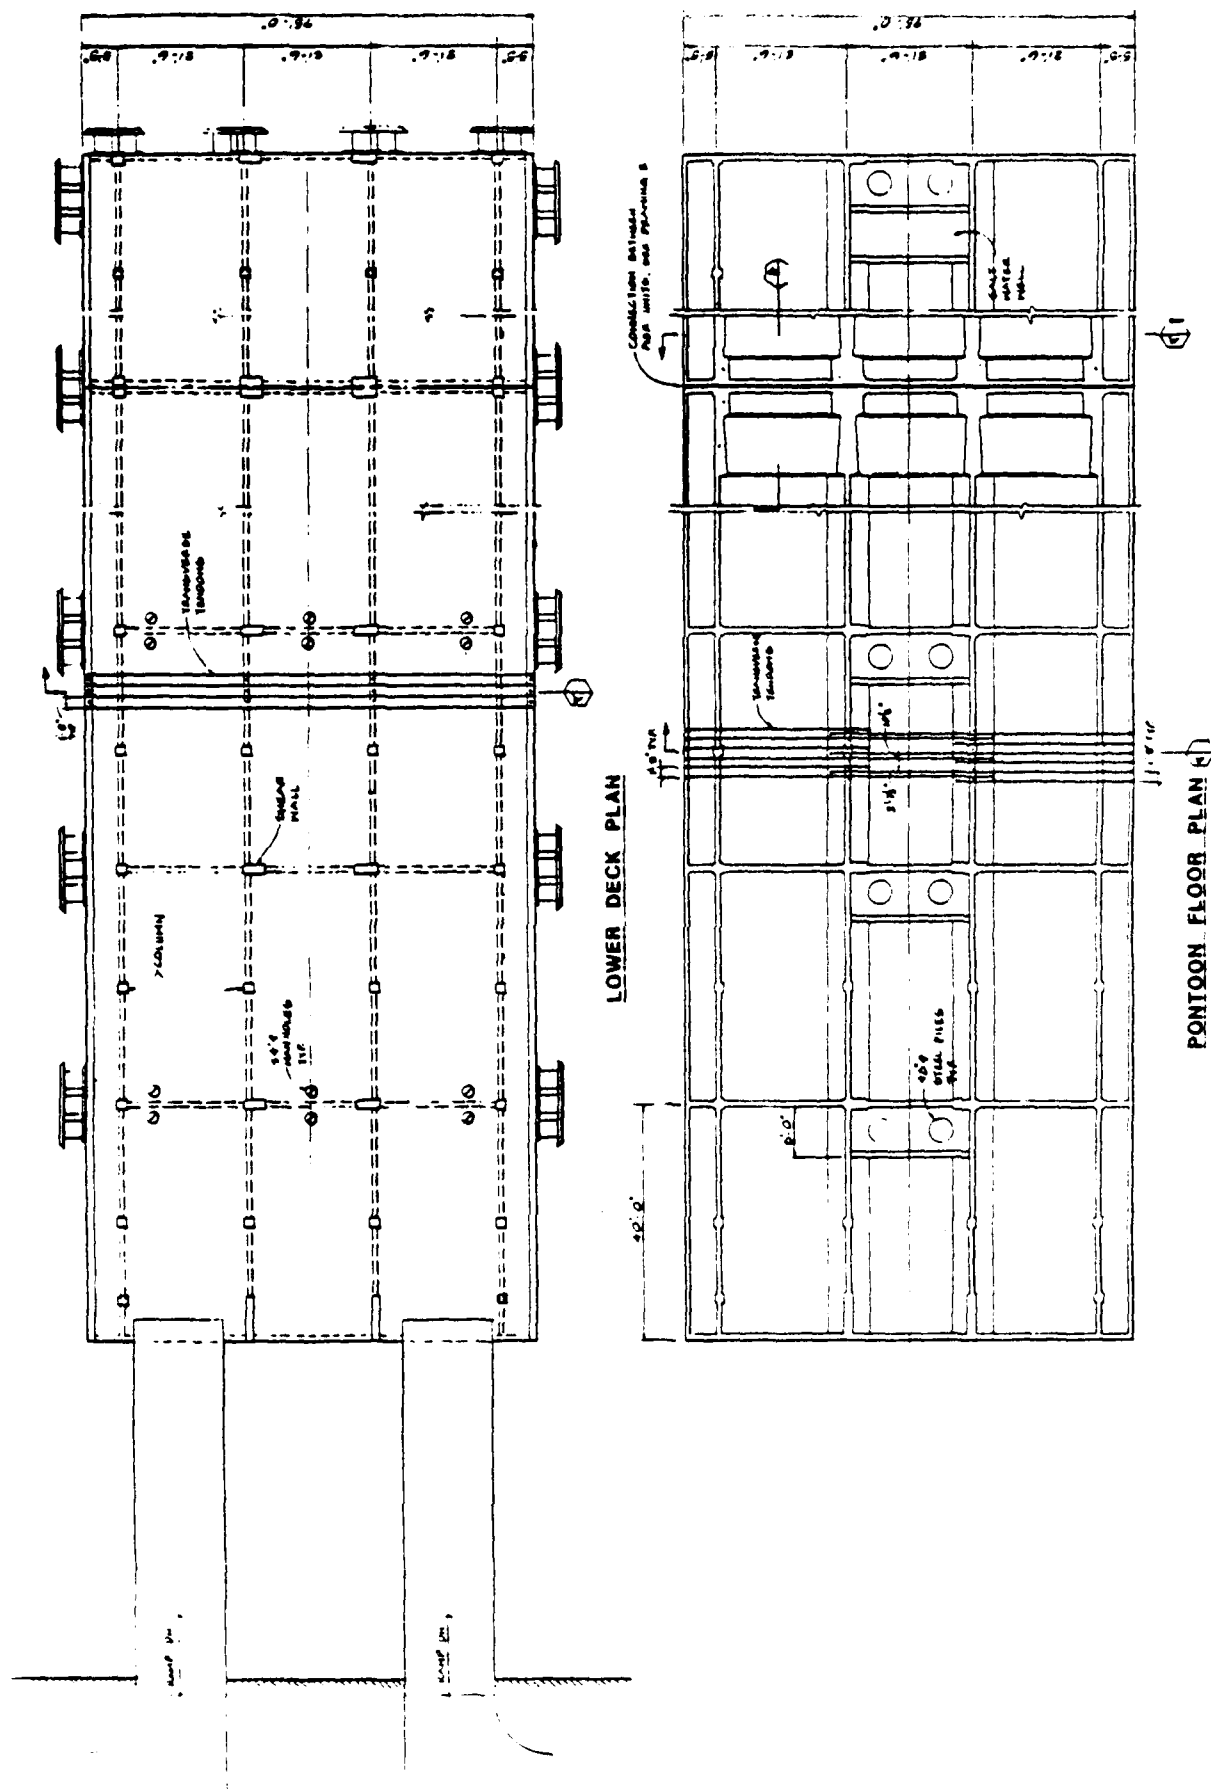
Floating Pier, Lower Deck and Pontoon Floor Plans.
